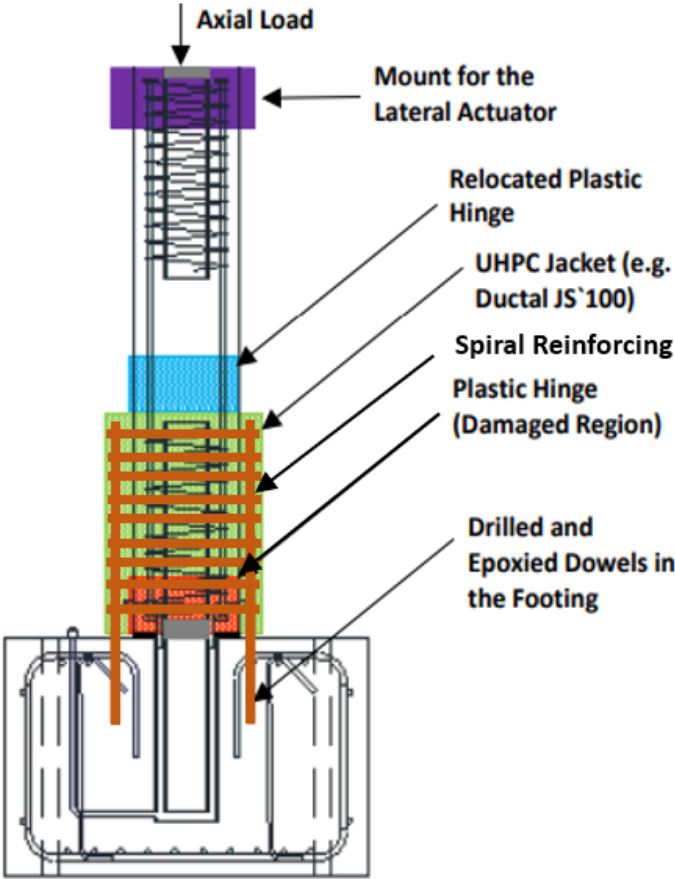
Retrofit Concept for Precast Concrete Pier
